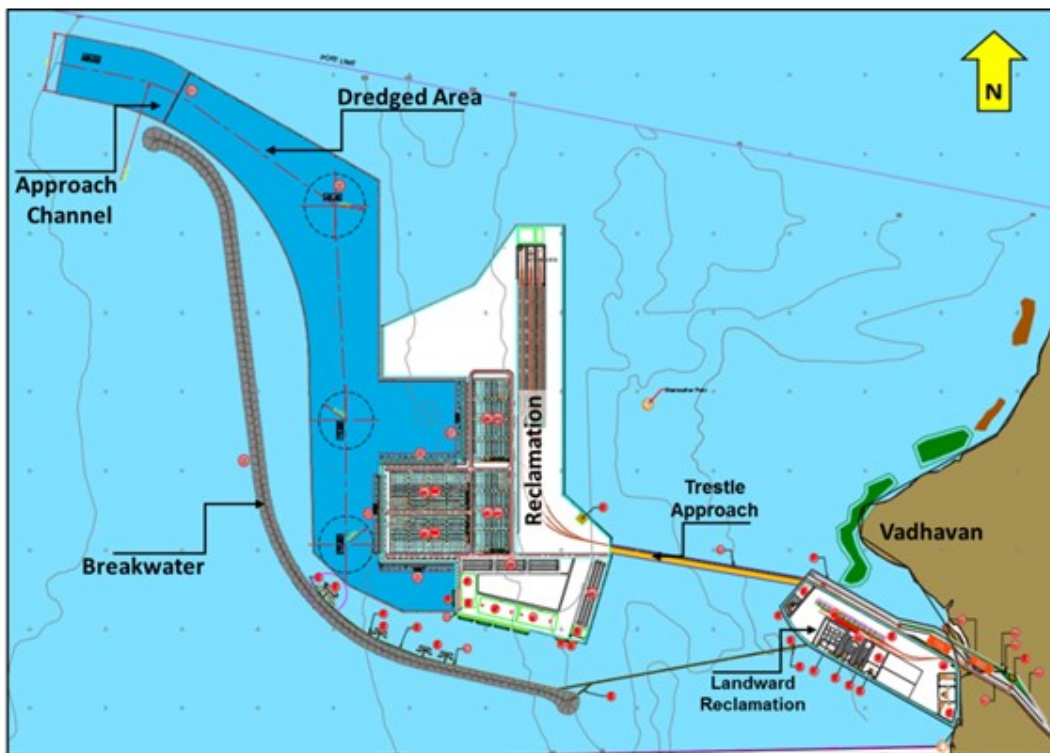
B: Proposed Final Modified Phase-I Layout at Vadhvan
